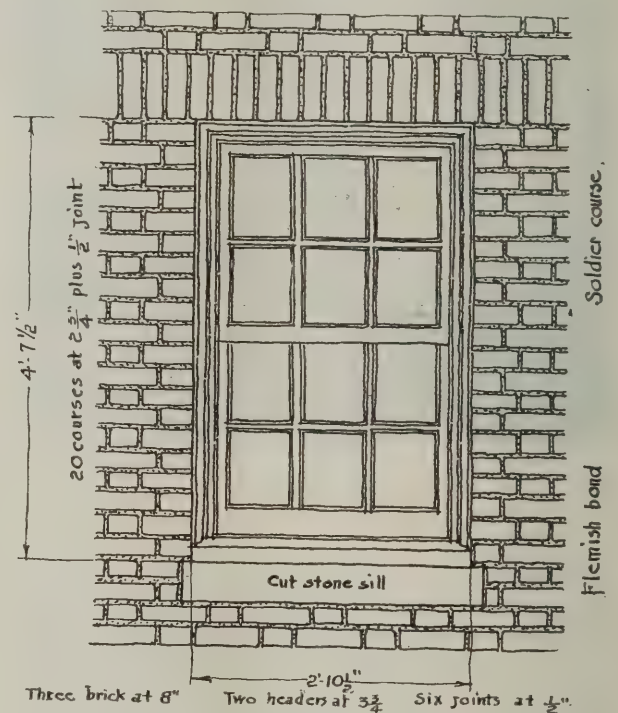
DETAIL OF REVEAL, DOUBLE HUNG SASH IN BRICK WALL
